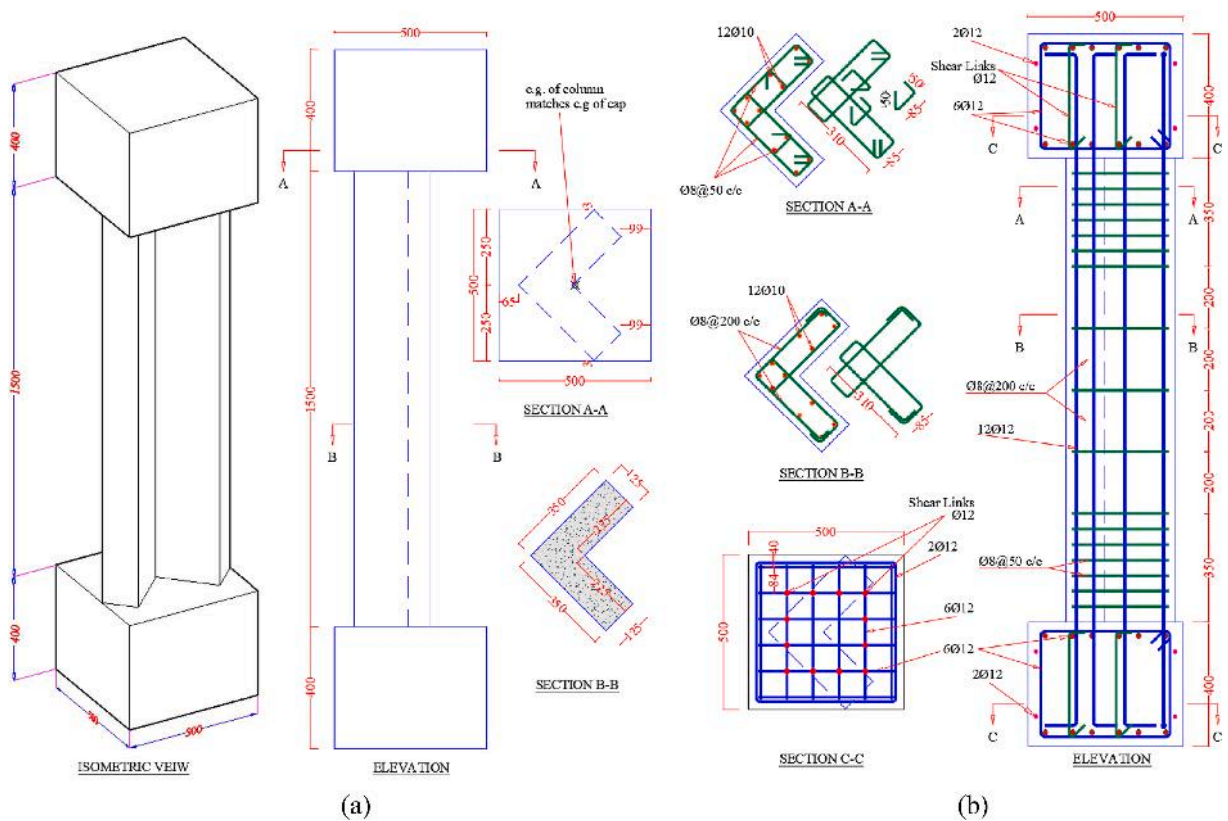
Details of 90° L-shaped specimens: (a) Concrete dimensions; (b) Reinforcement details (Dimensions in mm).
